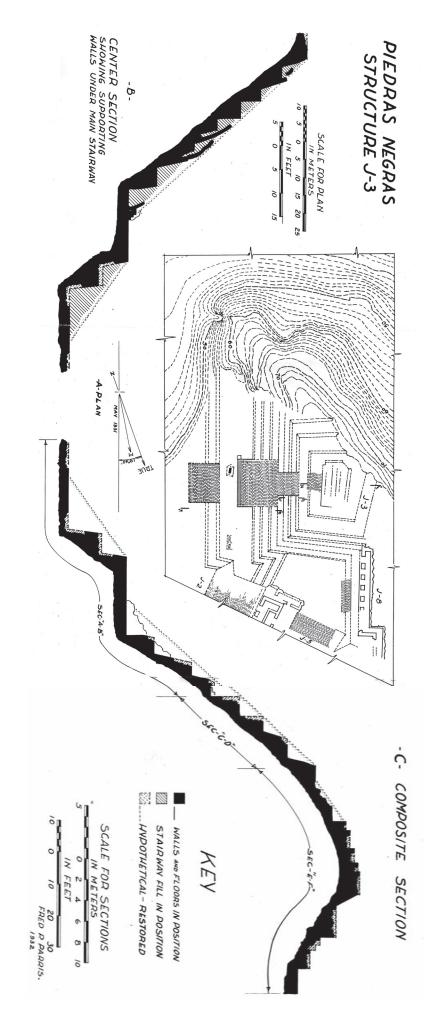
a. Plan Structure J-3. Excepting stela cists, broken lines indicate re-stored features, fallen or not excavated; b. center section; c. composite section.
